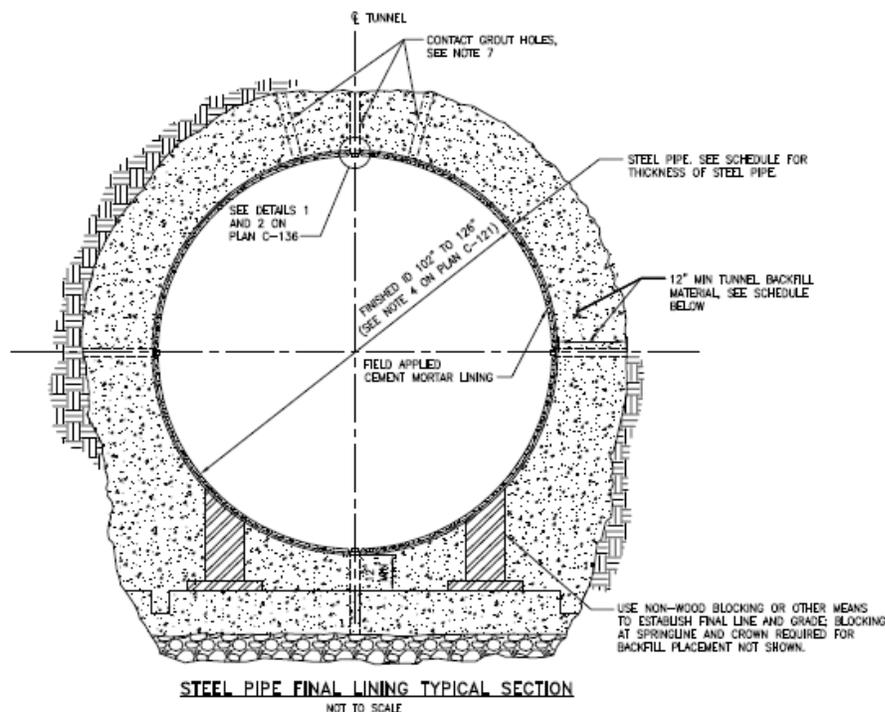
Typical horseshoe-shaped tunnel with the carrier pipe inserted and grouted in place
